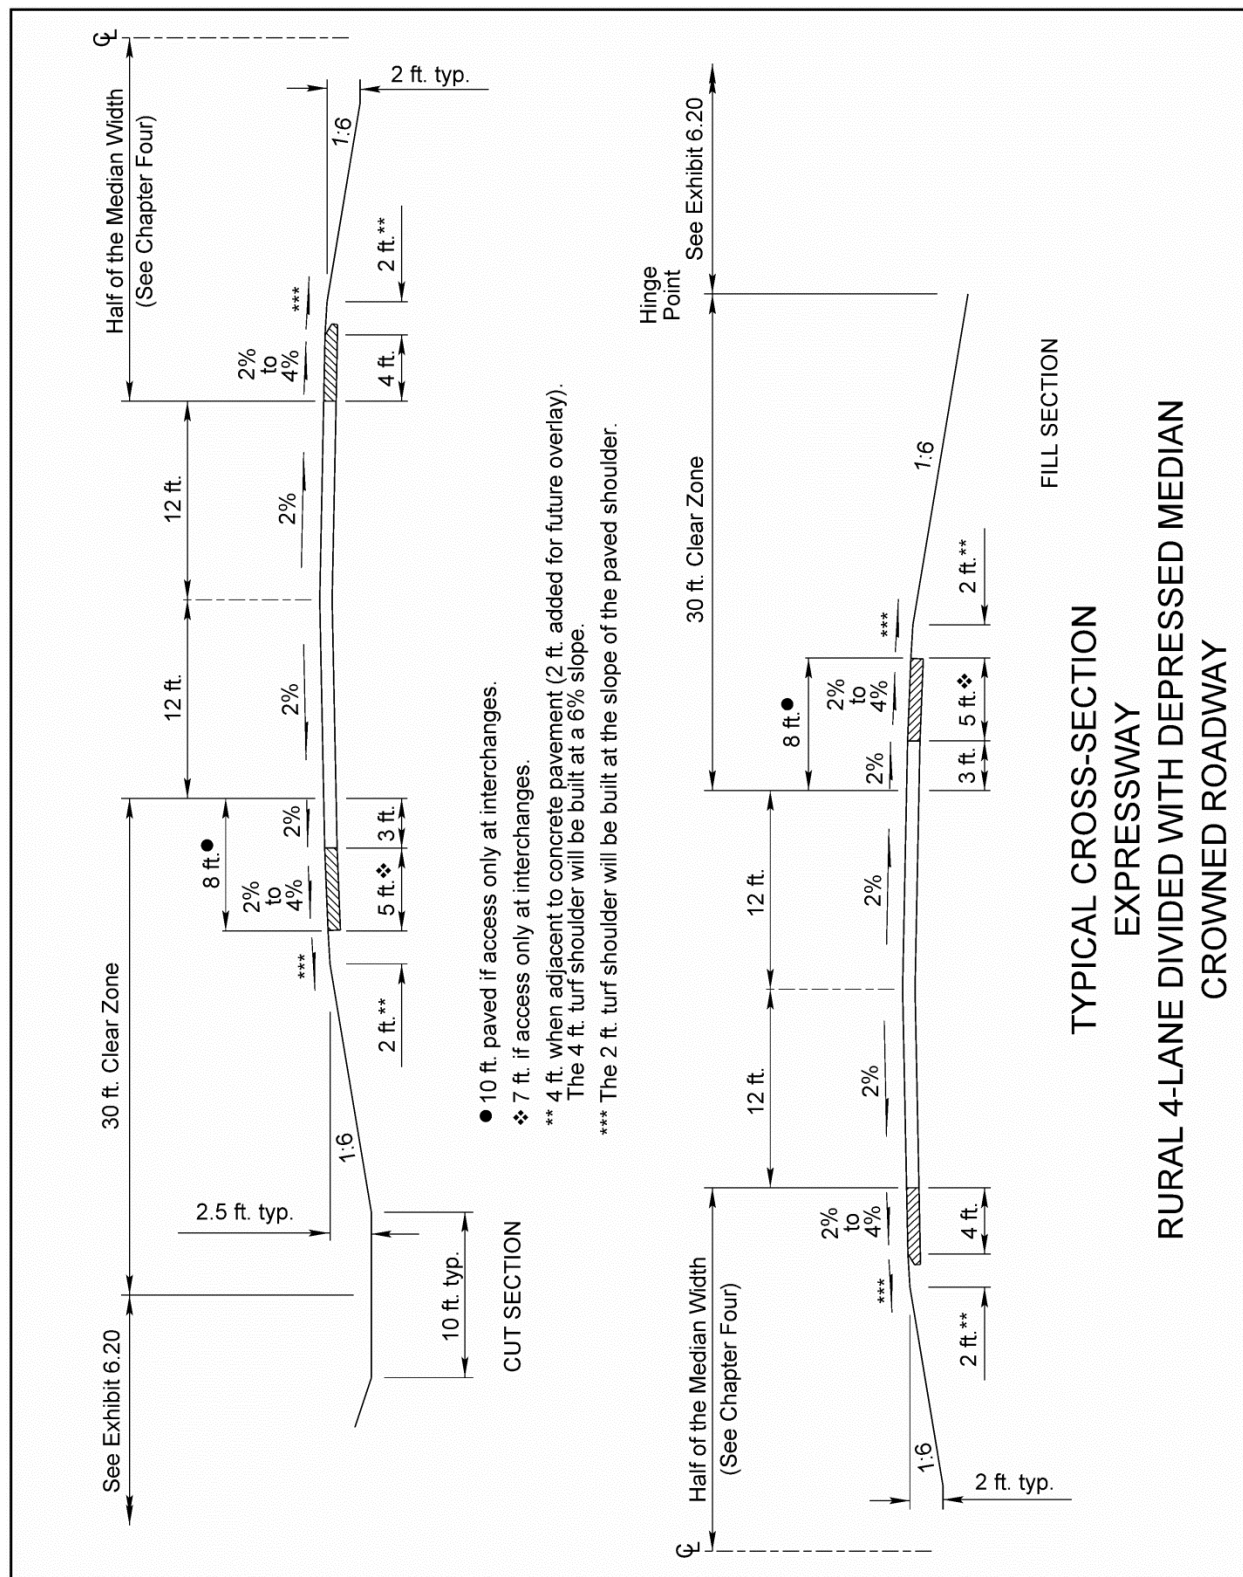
Typical Section - Rural Four-Lane Divided Expressway with Depressed Median (Crowned Roadway)
